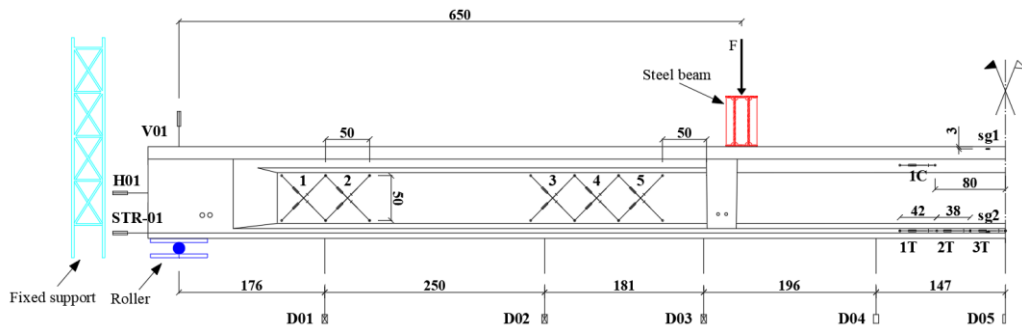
Test setup and layout of the monitoring system installed on B9-P47/46 girder (unit: cm).
